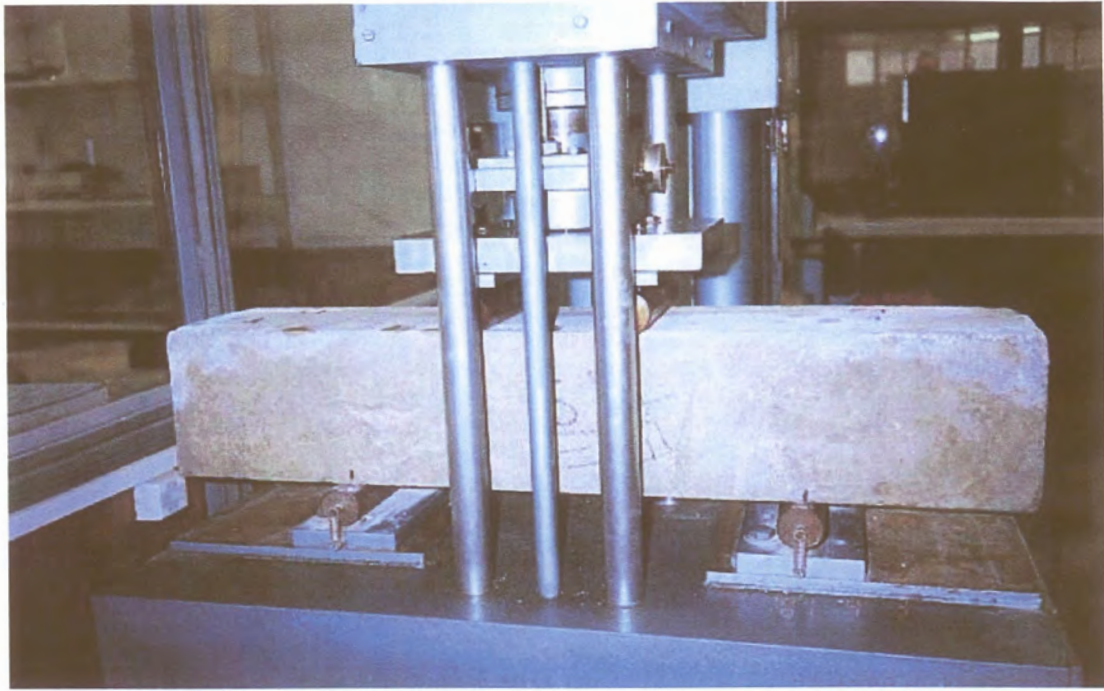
Determining modulus of rupture of concrete in two-point loading press
